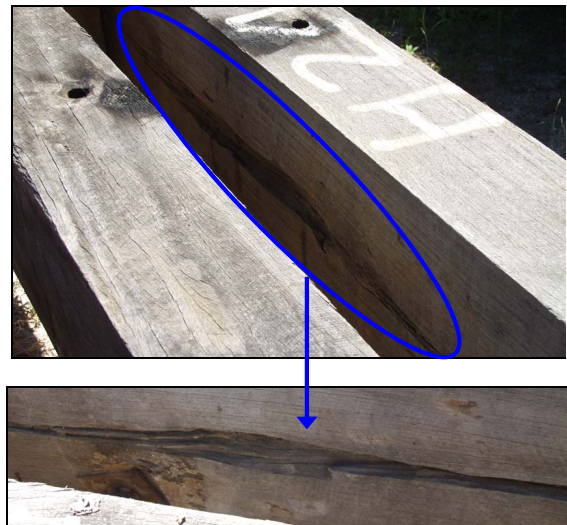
Crack at the inside face of the western half-cap on pier 24.
